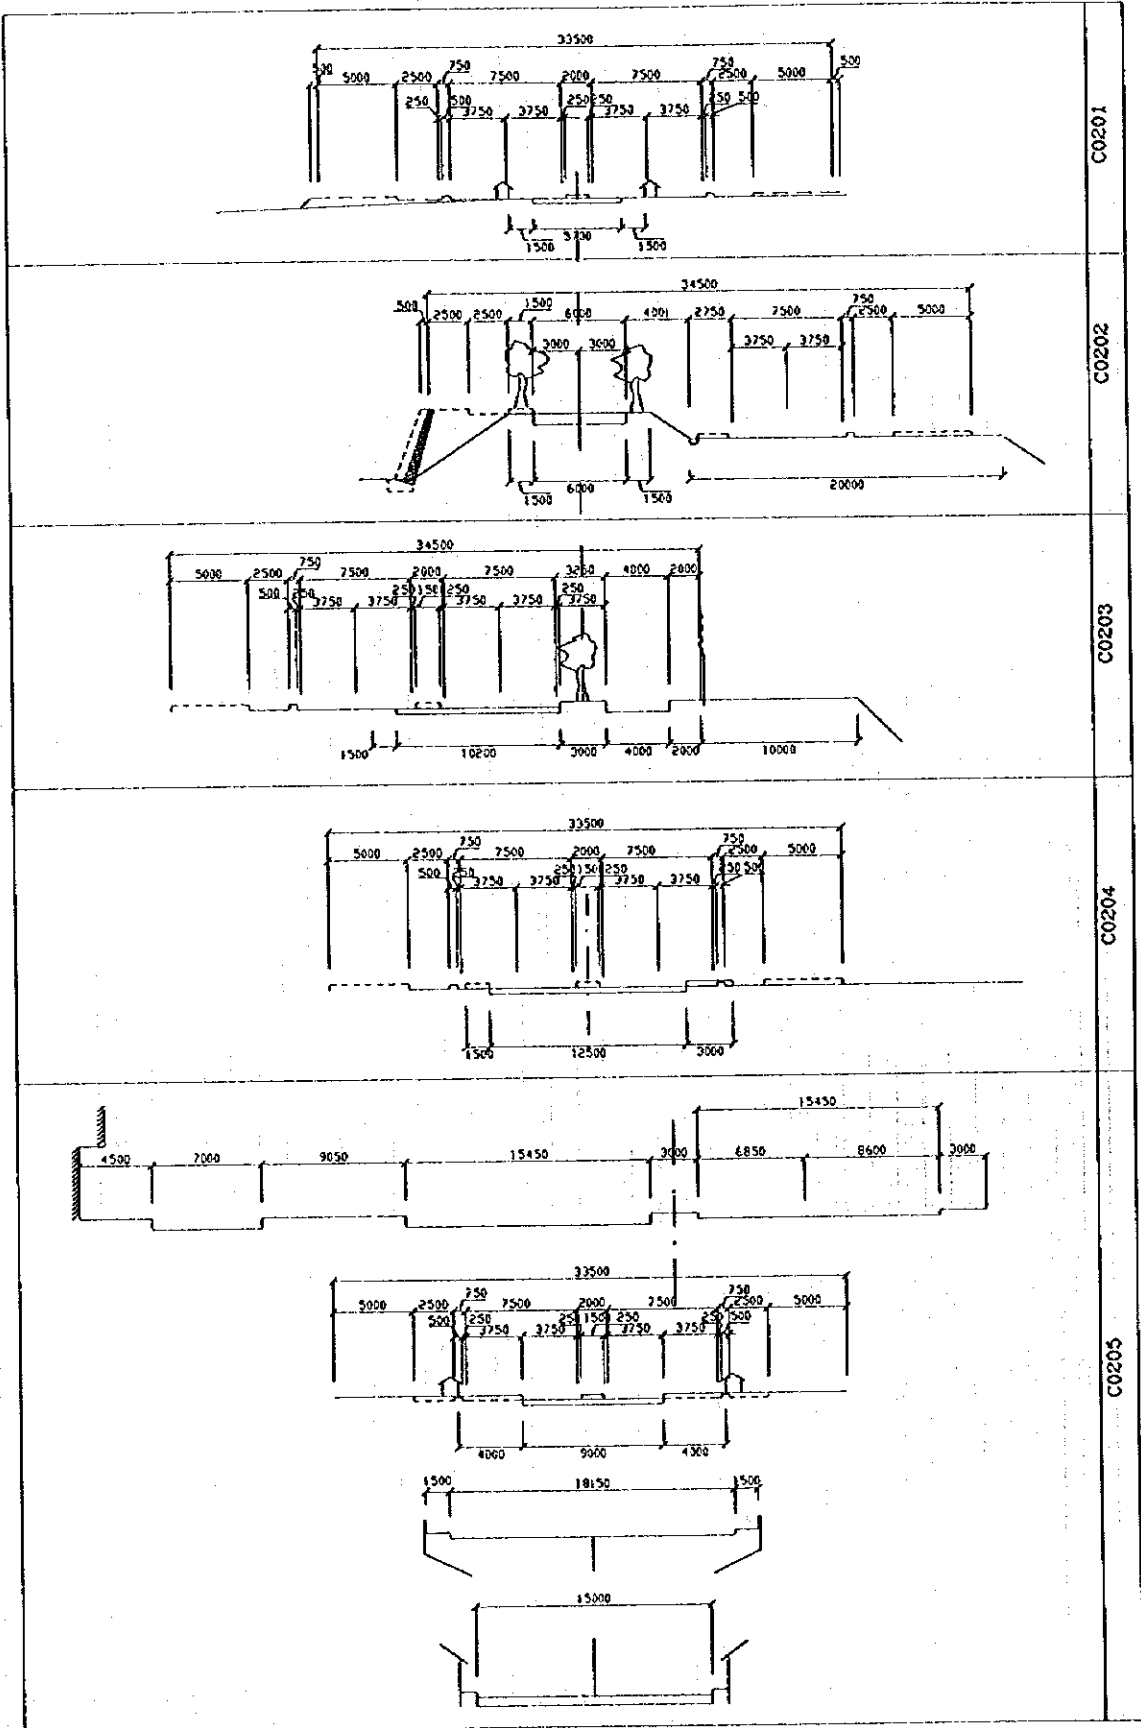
Improvement Scheme of Ring Road 2
